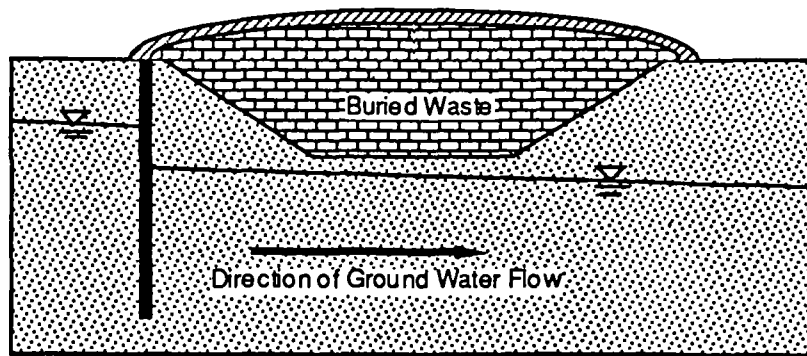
Example of Vertical Cutoff Wall to Limit Flow of Ground Water through Buried Waste.
